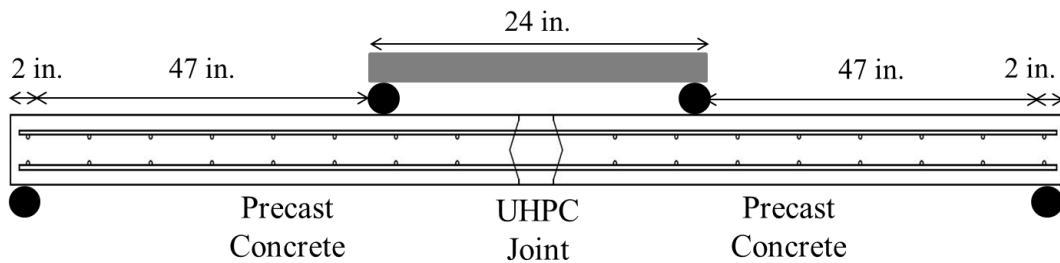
Four Point Bending Test Set Up for Flexure Test for Specimens F-100-1P-1, F-100-1P-2, F-100-2P-1 and F-100-2P-2
